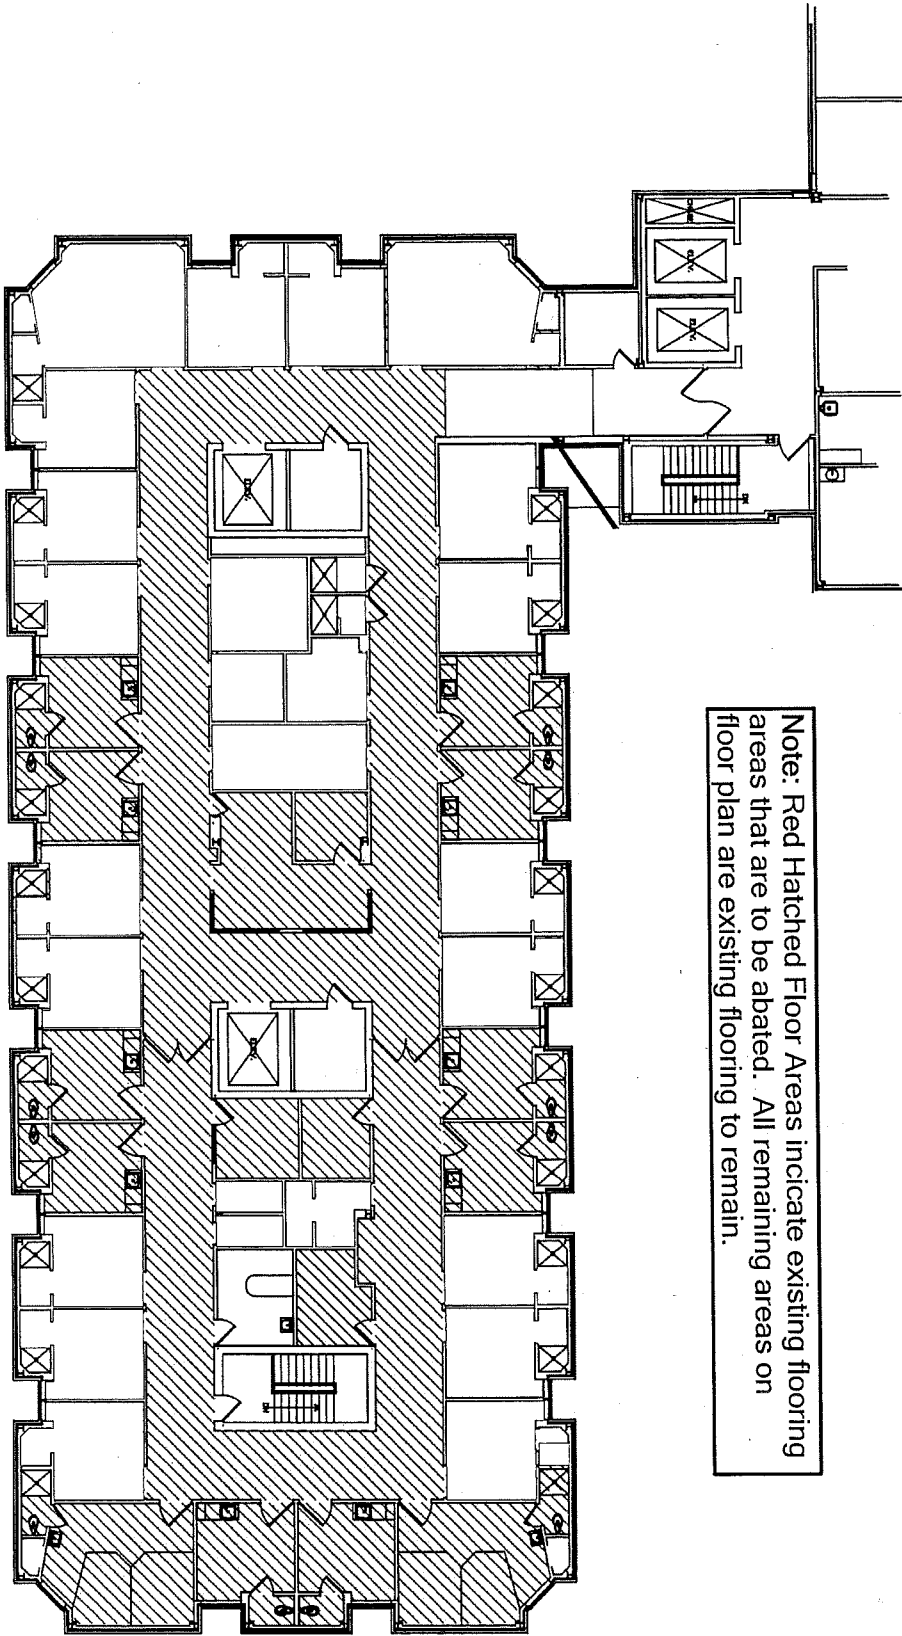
ACM Flooring Mastic Locations (page 1)
